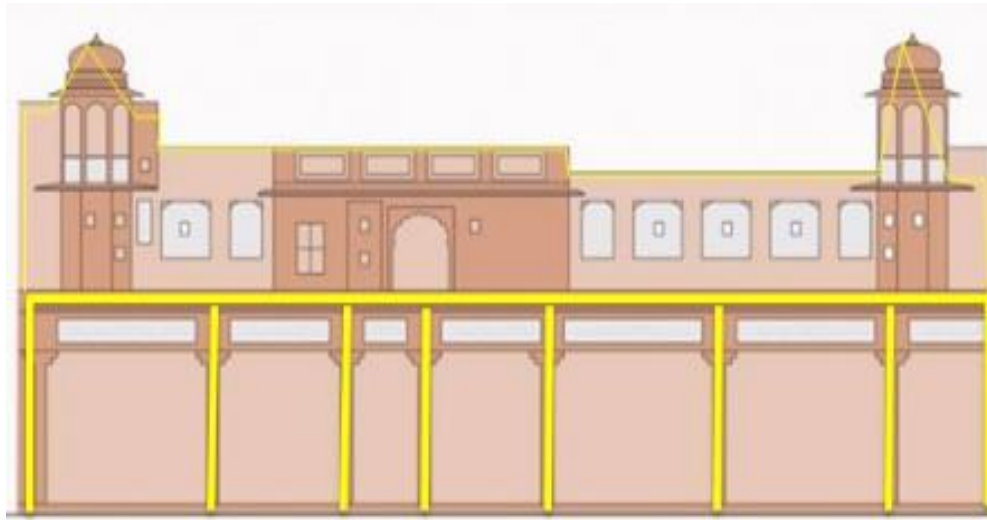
Facade of badi chaupar (source: traditional jaipur study,2014)
